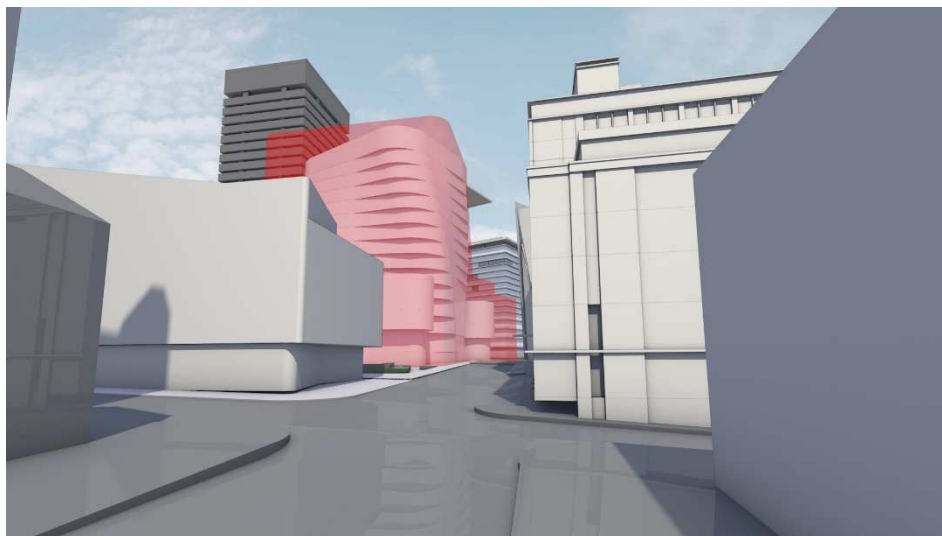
Approved building envelope framing CB02 Podium and Tower as seen from Jones Street
